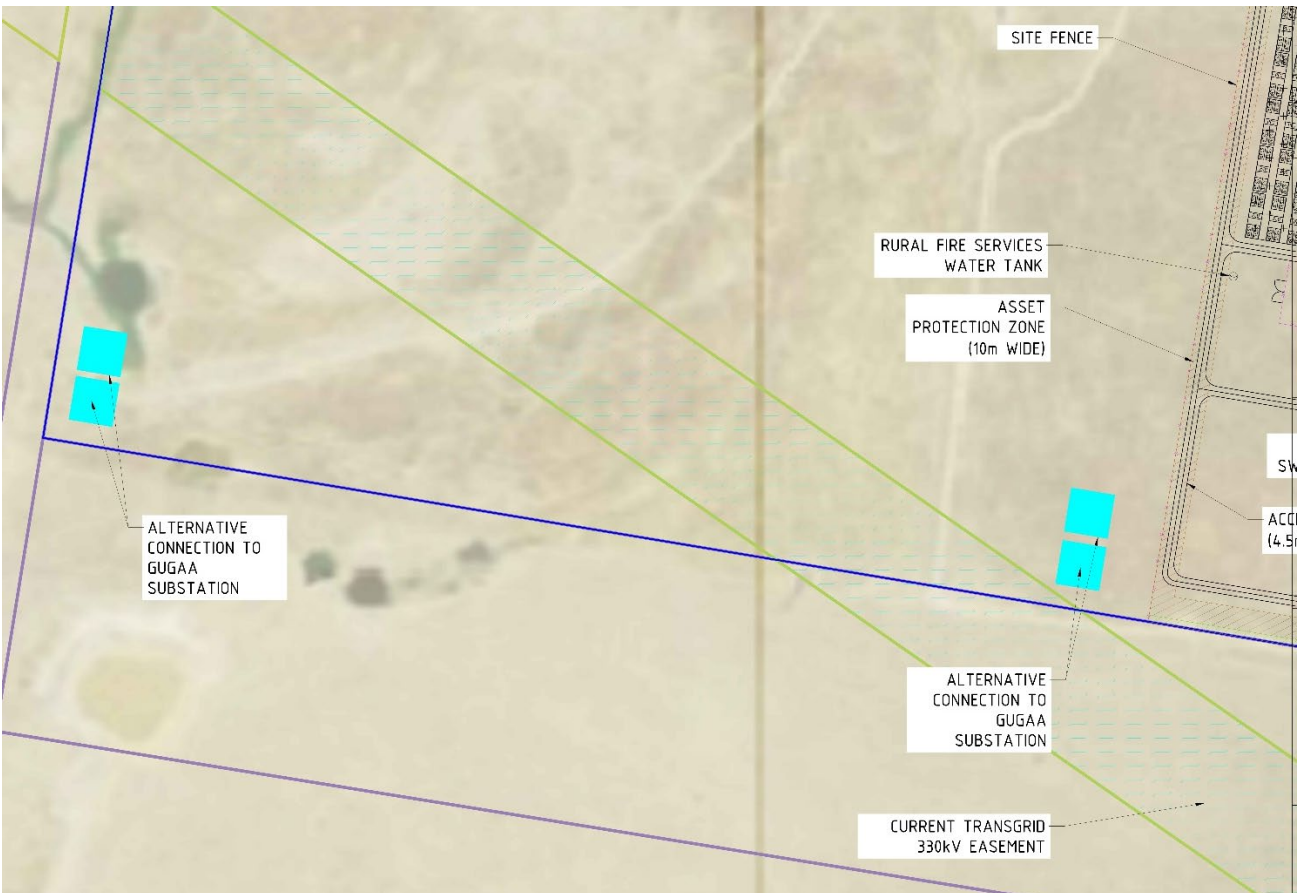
Alternative connection path to future relocated power line easement at southwest corner of the site
